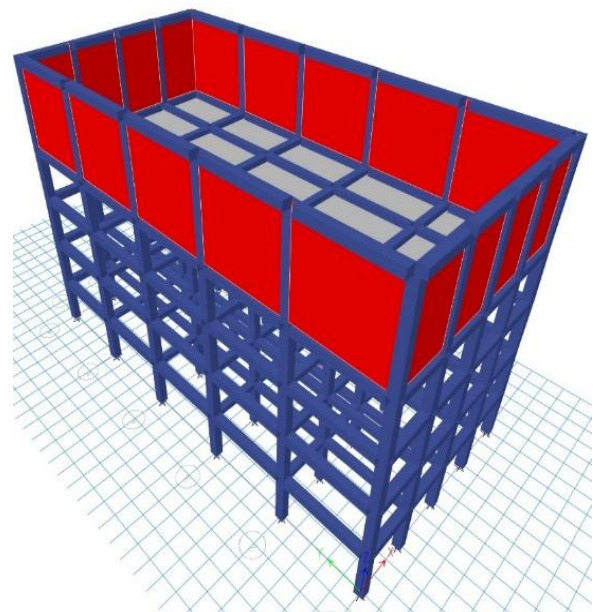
Reinforced Concrete Elevate Over-Head Water Storage Tank
